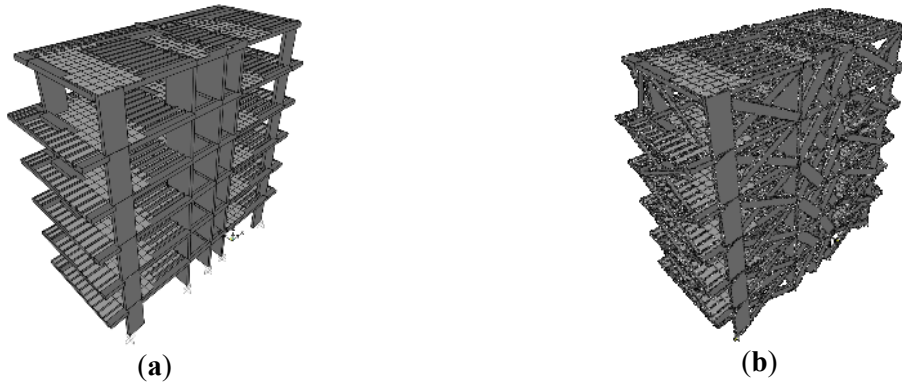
Modellings (a) without infill wall; (b) with infill wall
